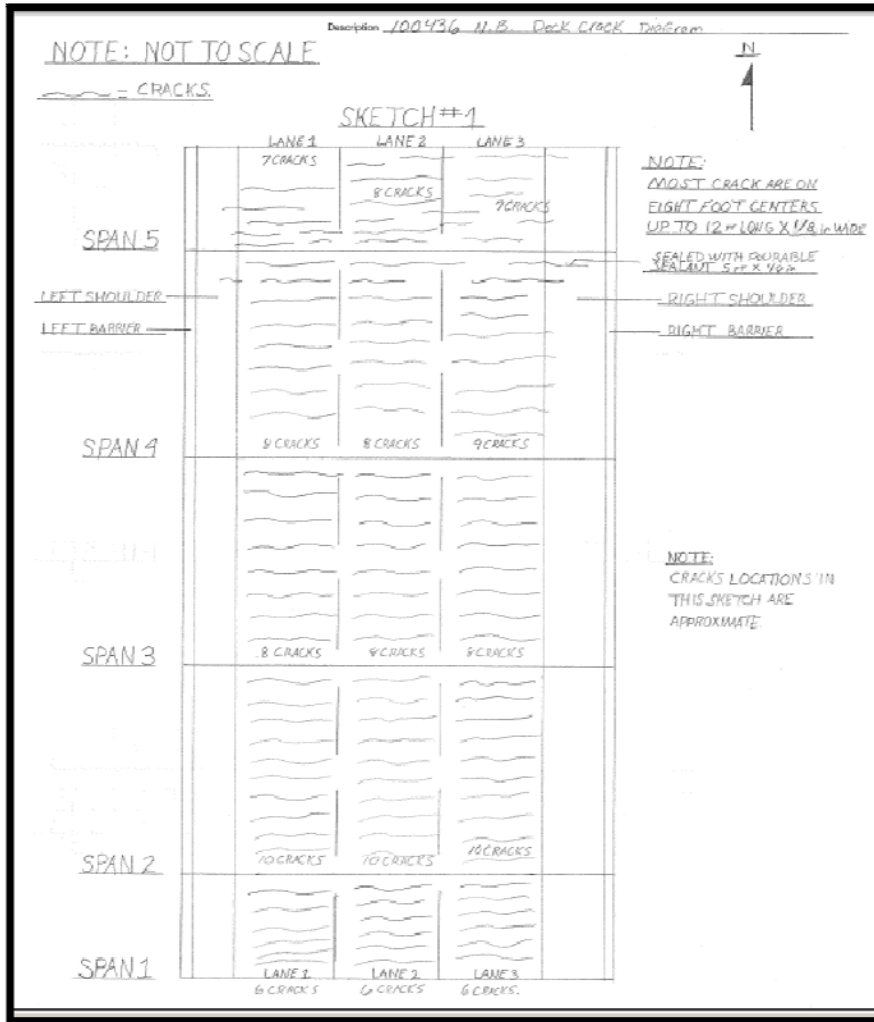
Bridge No. 100436, Transverse Cracking Pattern
